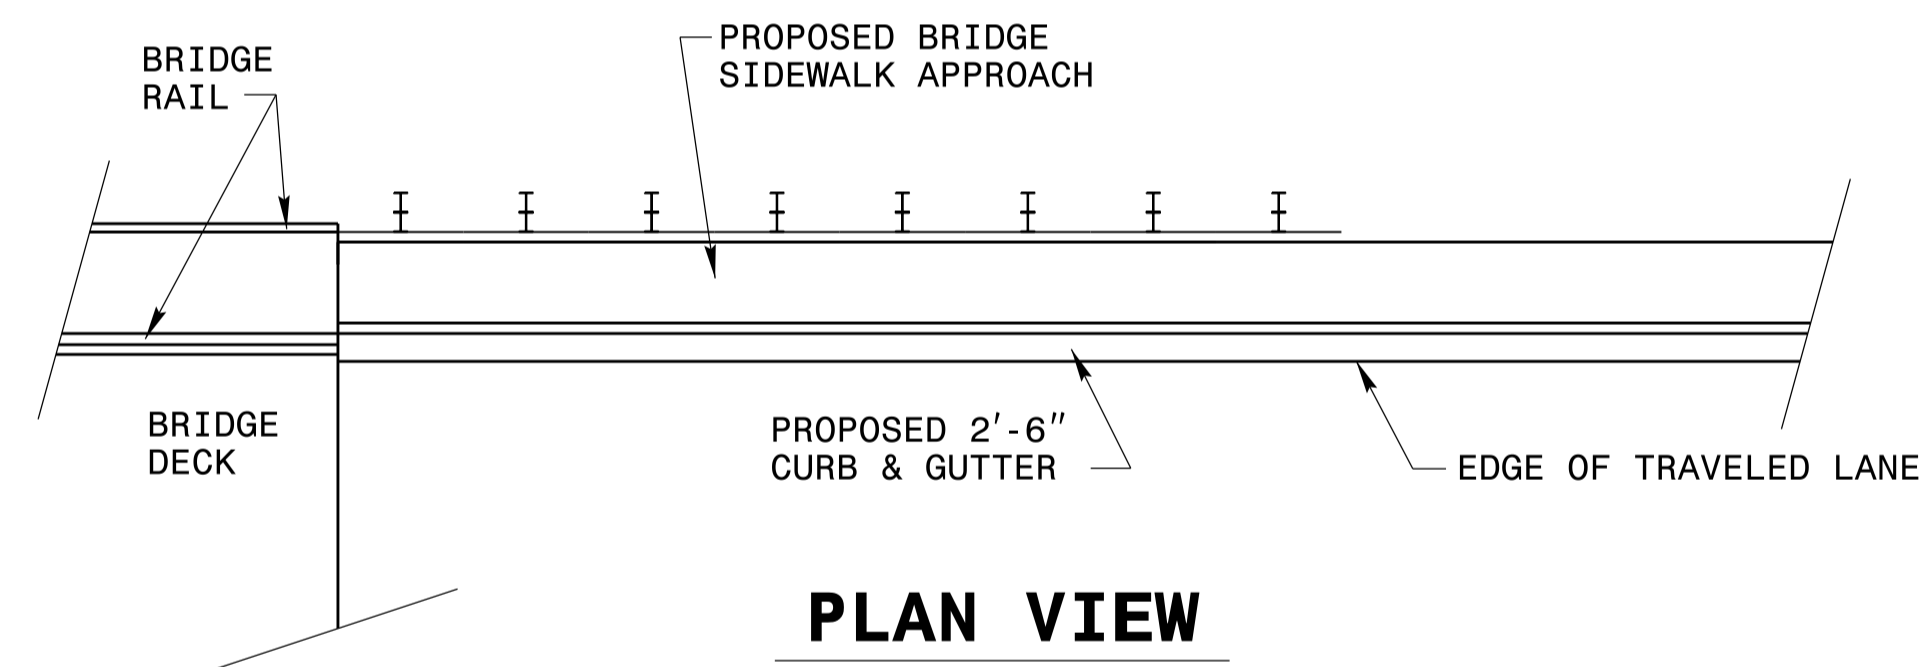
DETAIL OF PROPOSED CONCRETE BRIDGE SIDEWALK APPROACH
